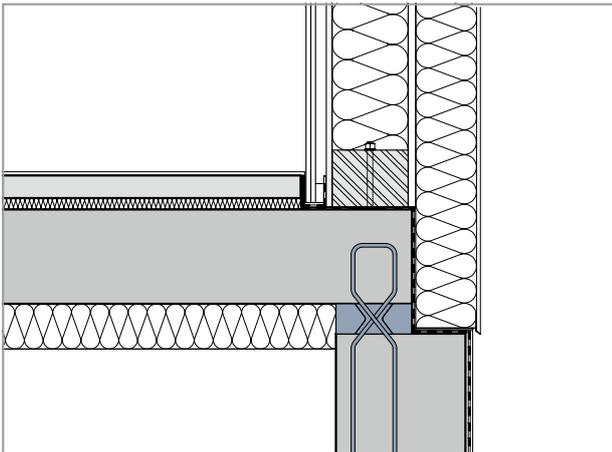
External wall with Schöck Sconnex® type W above an underground garage
